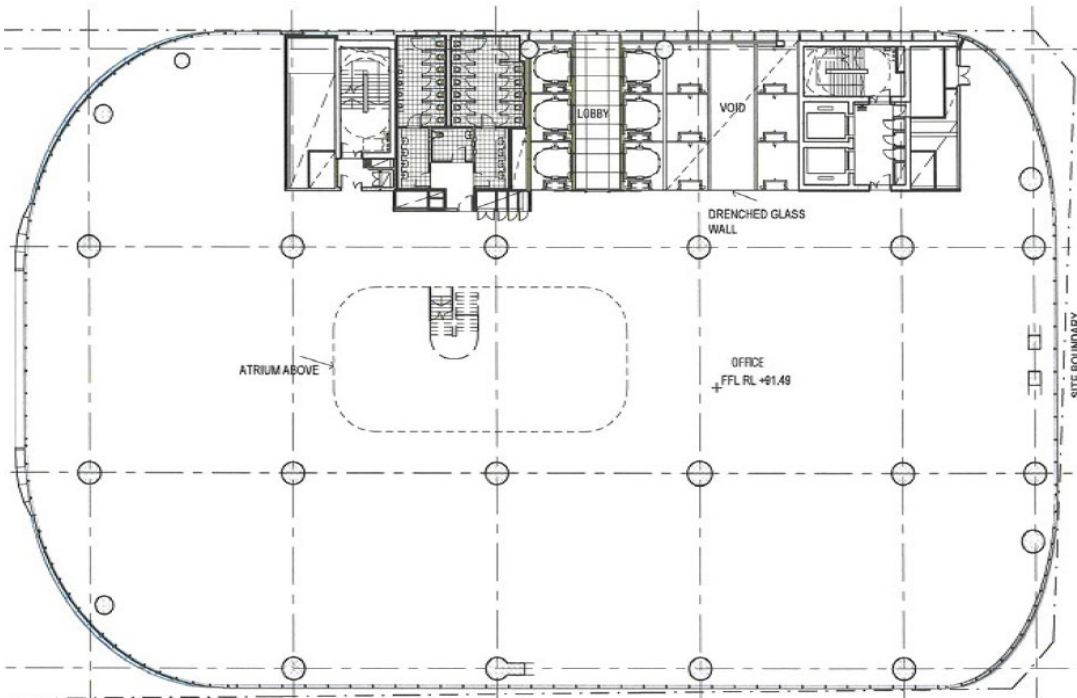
Approved stamped Level 16 plan showing inter-tenancy stair
